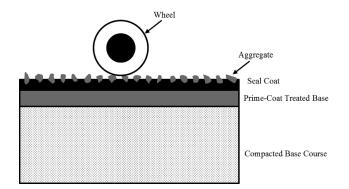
Typical pavement section after application of prime-coat and seal coat.
